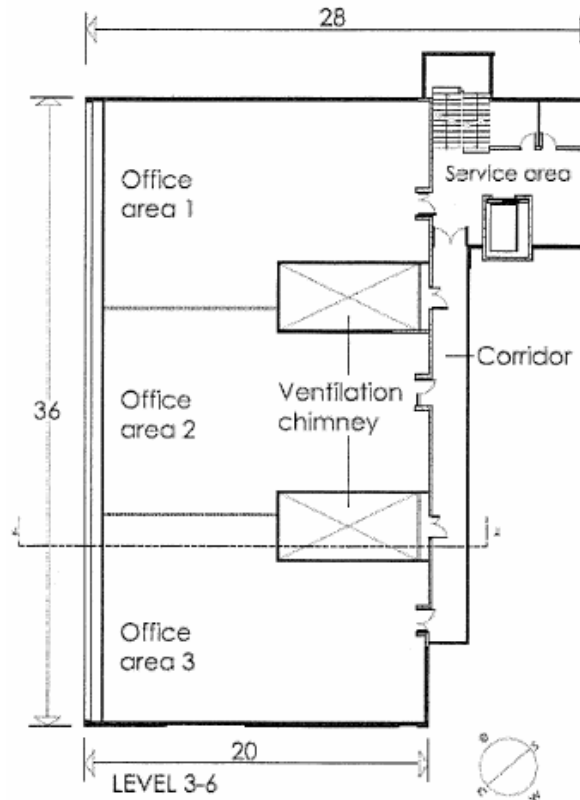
Architectural floor plan of case study building (Perez 2008)
